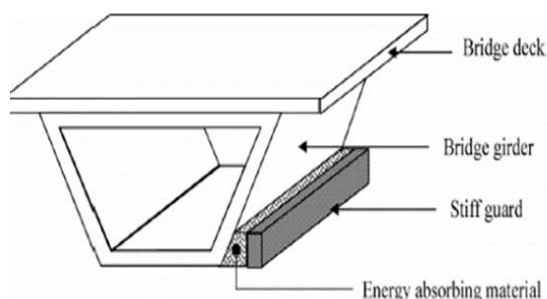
Application of EAMs (e.g., polyurethane foam) to dampen vibrations and minimize structural damage
